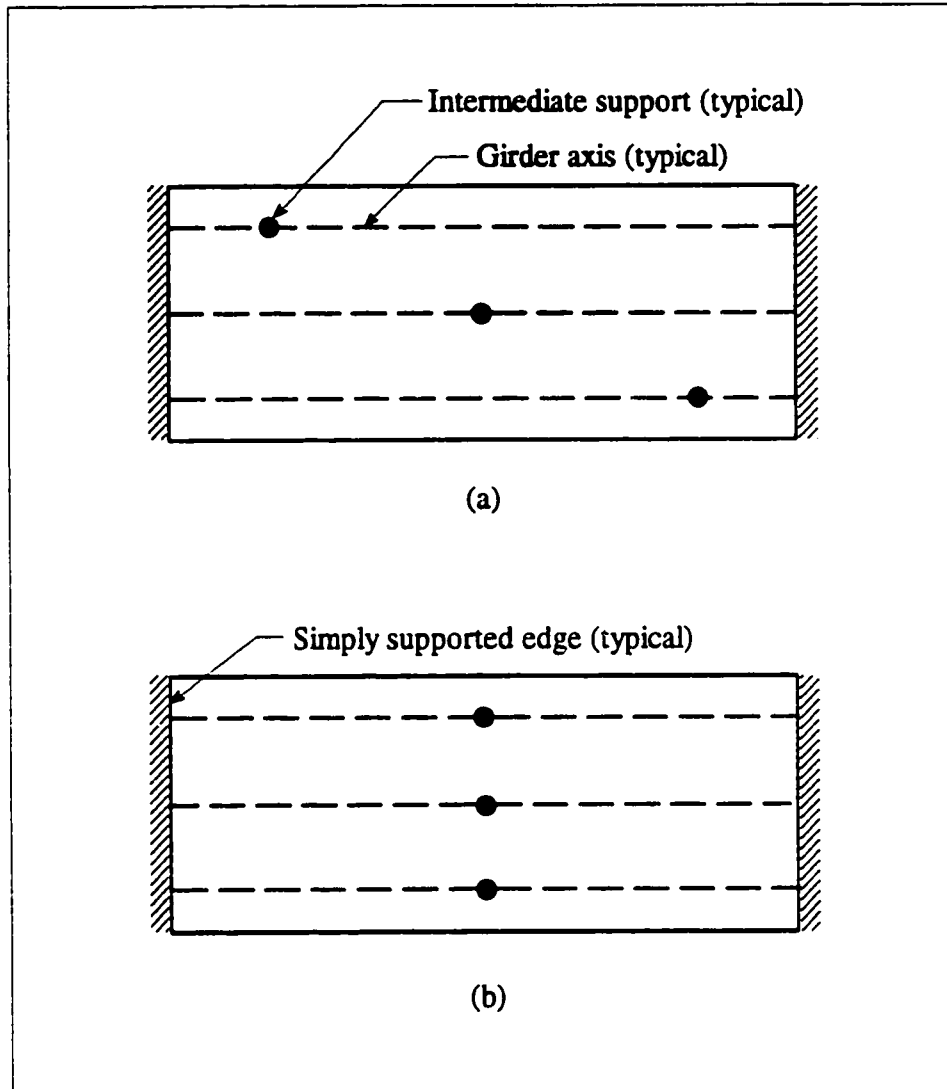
Plans of slab-on-girder bridges with intermediate supports
